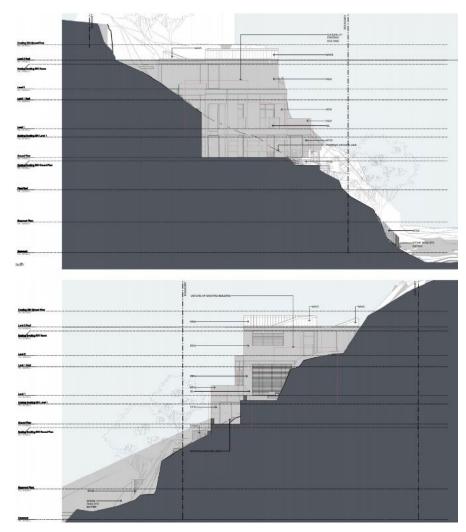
Top: Proposed south elevation, Bottom: Proposed north elevation, Extract from Elevations Sheet 2 (Source: Drawing No. 2001, Rev. A)
